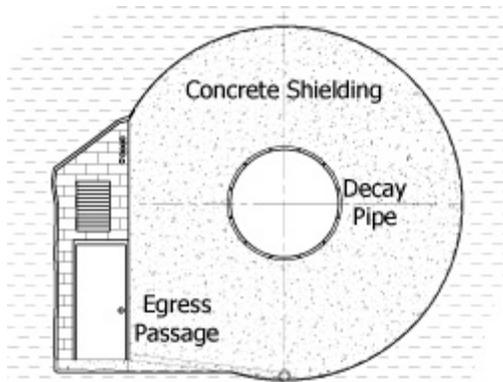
A cross section of the Decay Tunnel, at midpoint. Portions of the Tunnel were enlarged from the initial 22-ft bore, to allow adequate space outside the shielding for the Egress passage.
